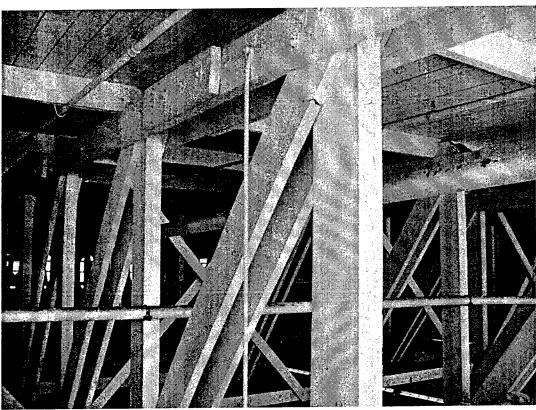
Fractured diagonal member CY of Truss 29.5, Area A.
